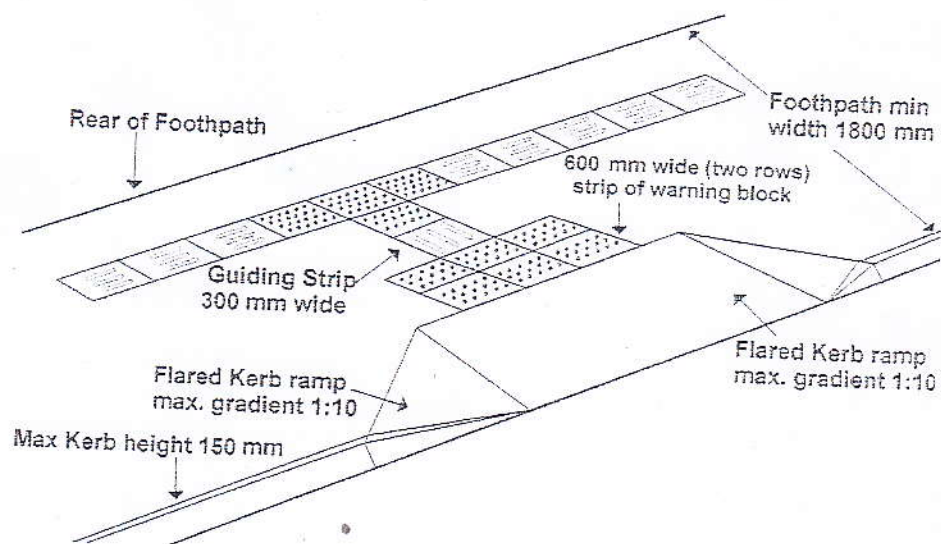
Kerb Ramp with Flared Sides and Tactile Pavers
